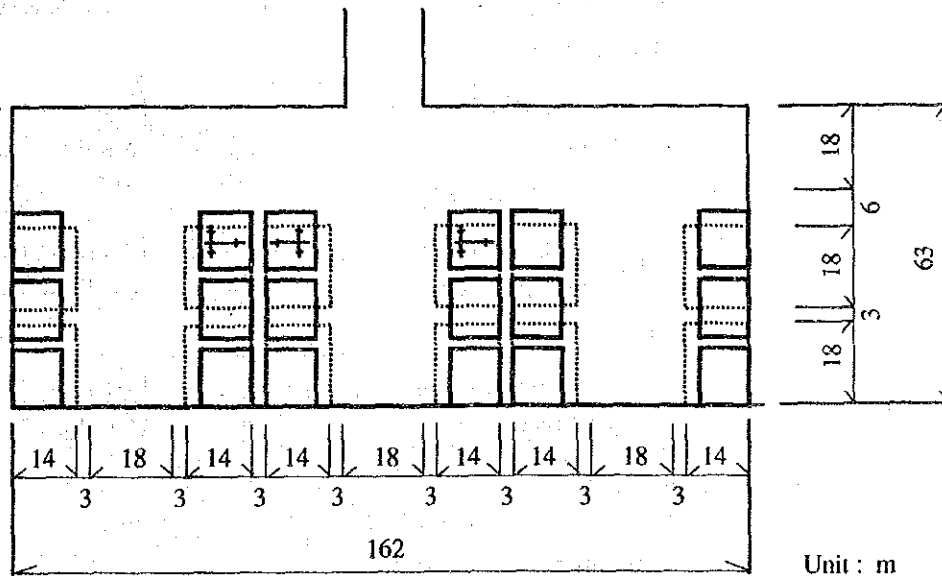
General Aviation Apron Arrangement for Master Plan
